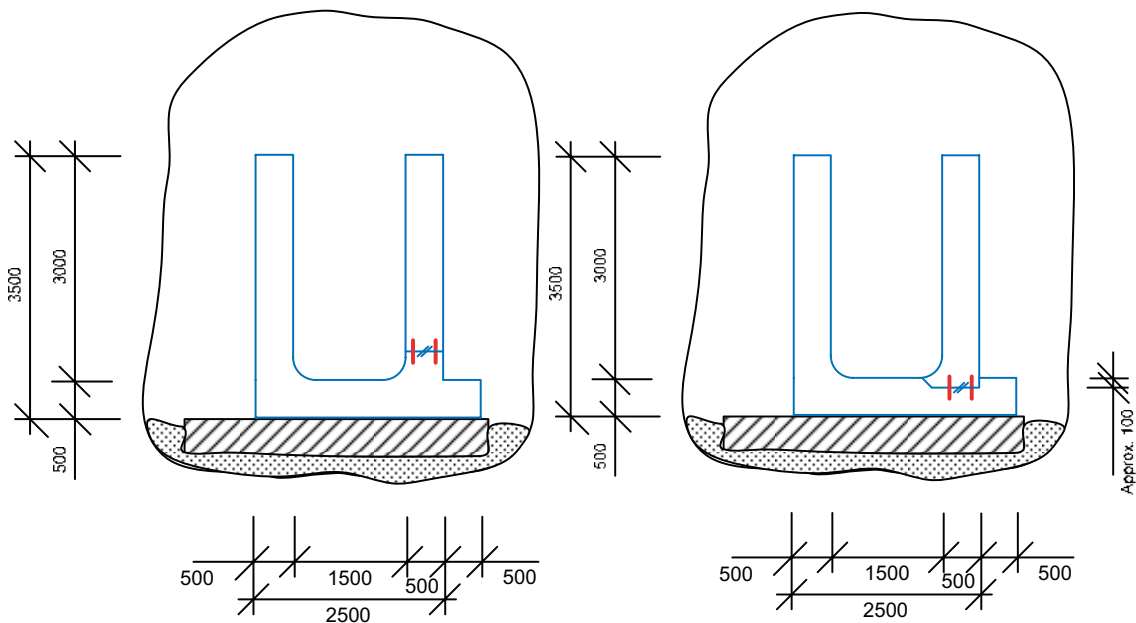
Placement of joint seals in component no. 2. All dimensions in mm.
